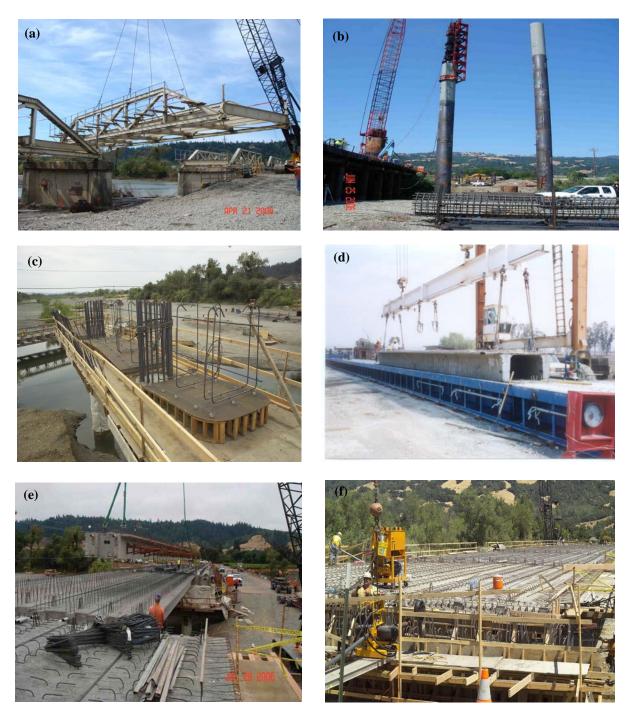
Construction of the Russian River Bridge: a) Demolition of Existing Truss Bridge,
